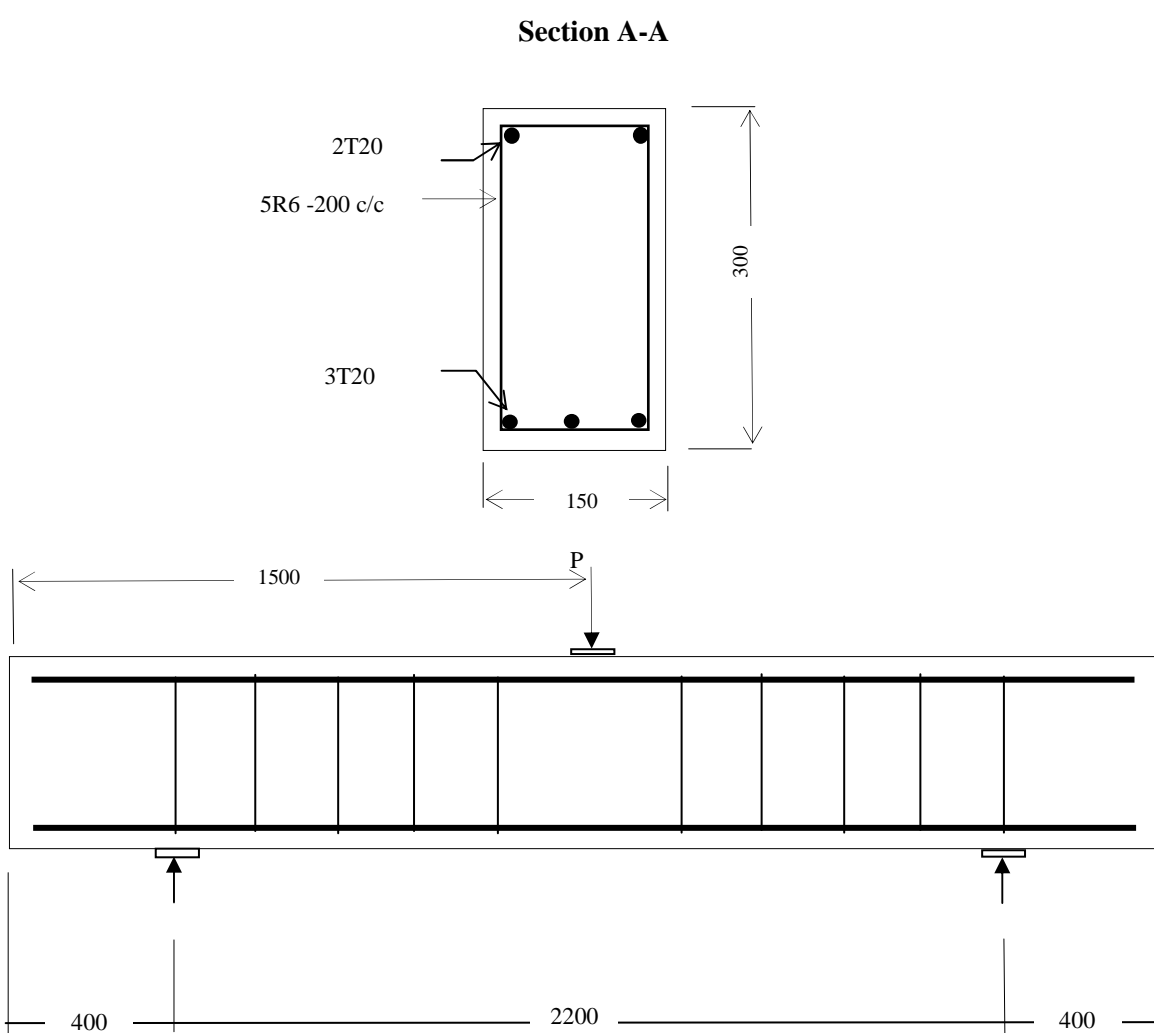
Reinforcement details for the HSC test specimen BJ-2 with point load in the mid-span, Shear span to depth ratio=4.15
